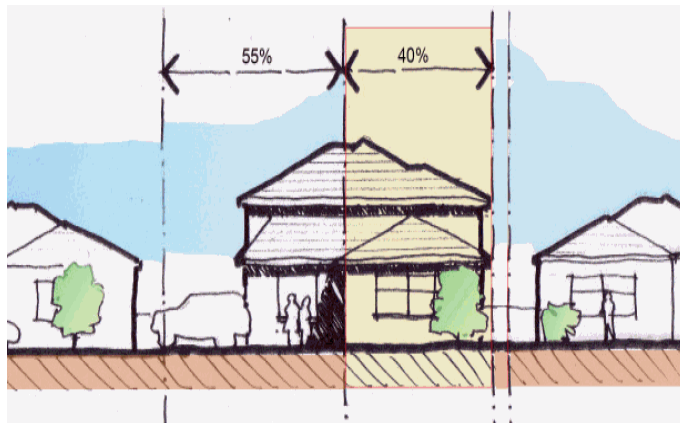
Secondary building façade must be setback 1.5m from the primary building façade.
